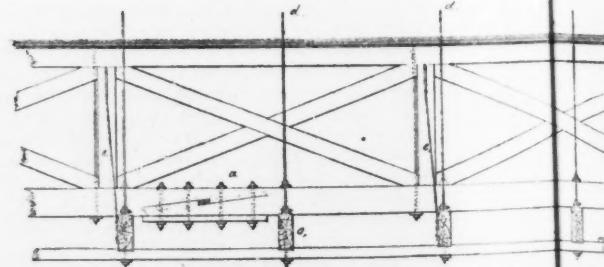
STIFFENING TRUSS; OLD LEWISTON & QUEENSTON BRIDGE.
